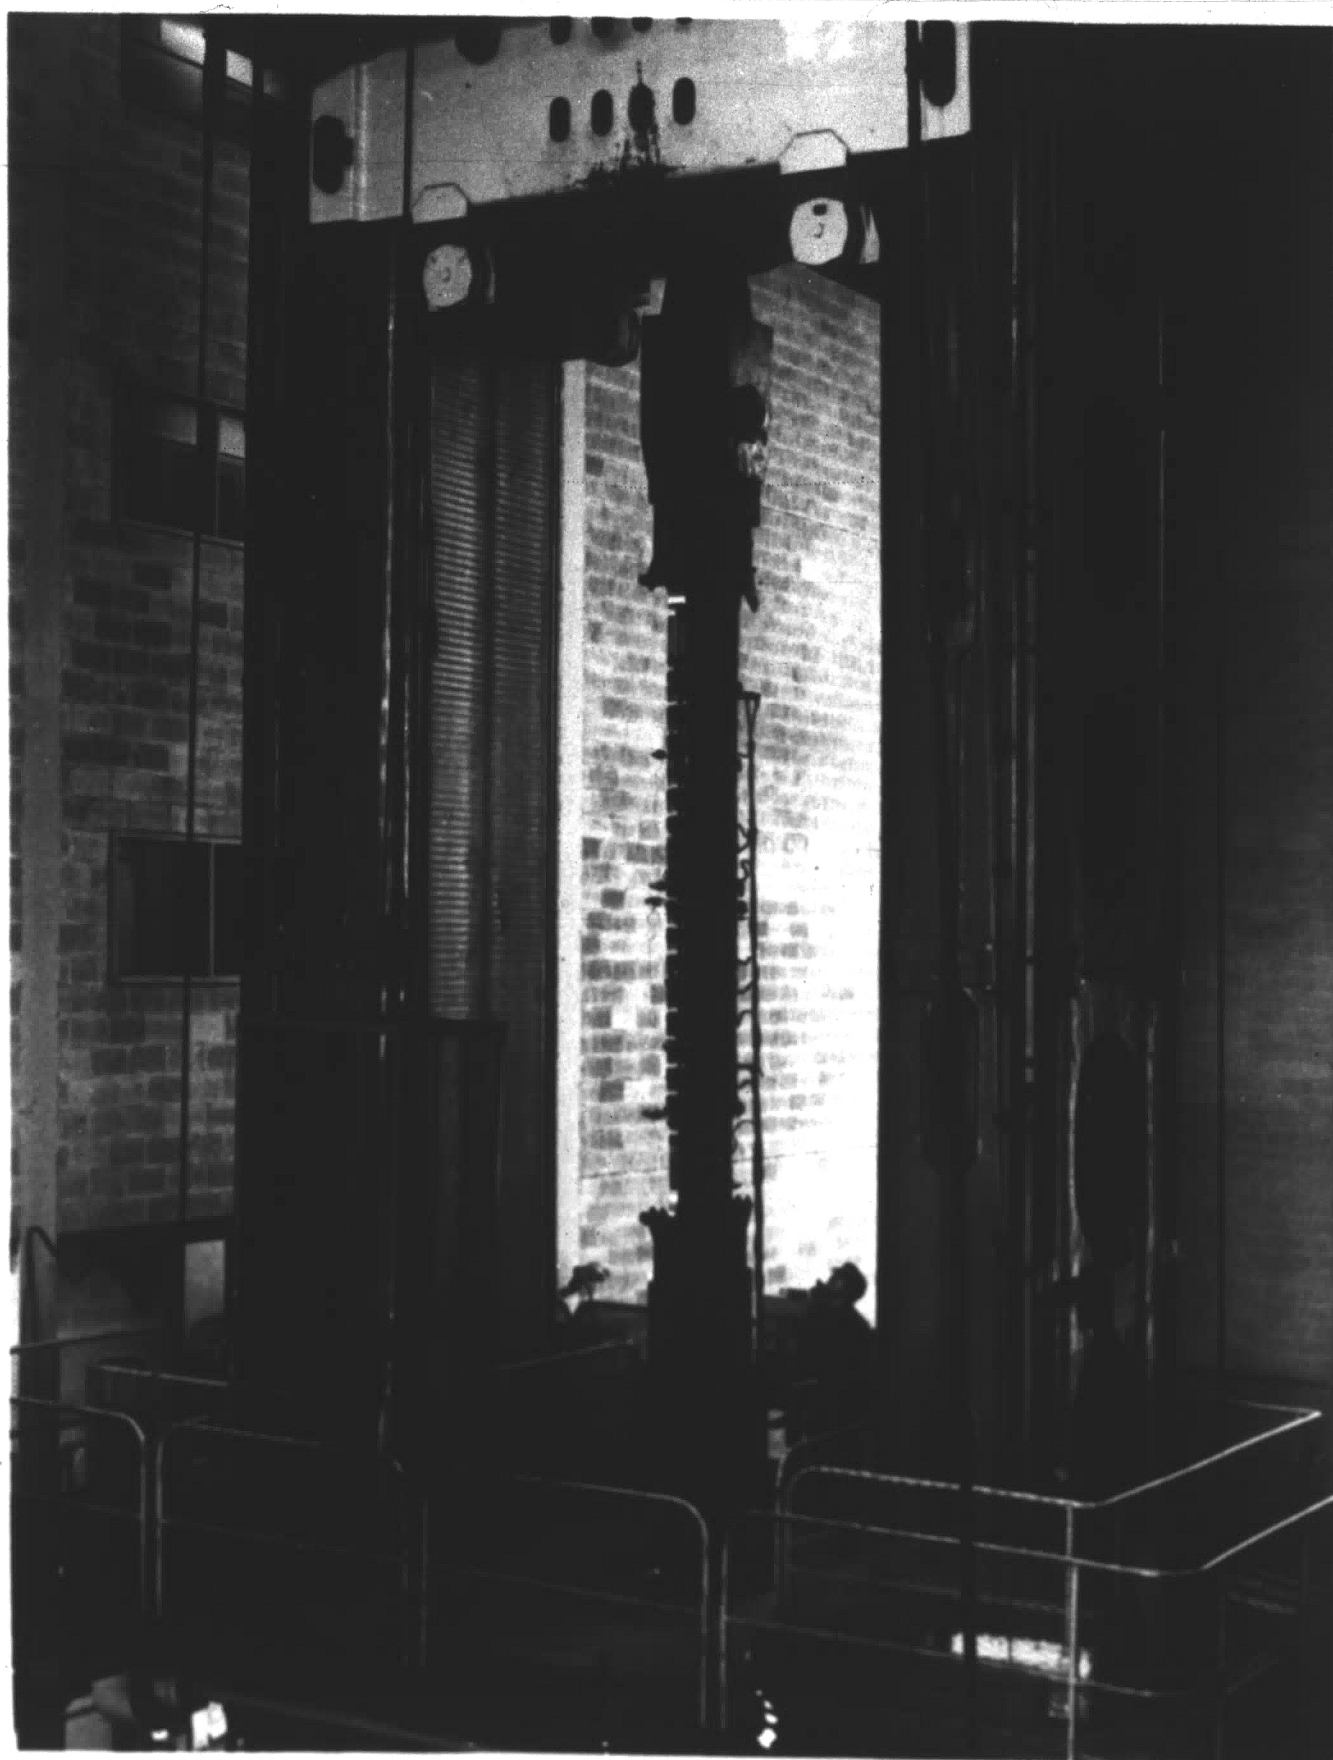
MODIFIED TEST JOINT IN 5,000,000 lb. MACHINE
